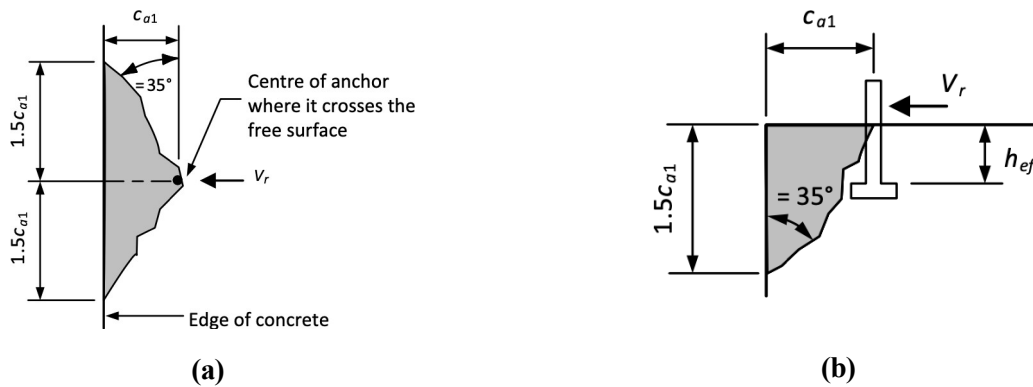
Breakout cone of headed anchor (a) in plan view and (b) section view (CSA, 2019)
